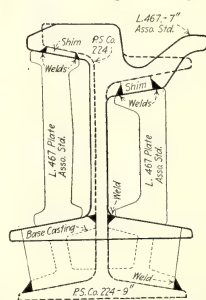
SHIMS WELDED TO PLATES TO TAKE UP SECTIONAL DIFFERENCE IN FISHING SPACE
